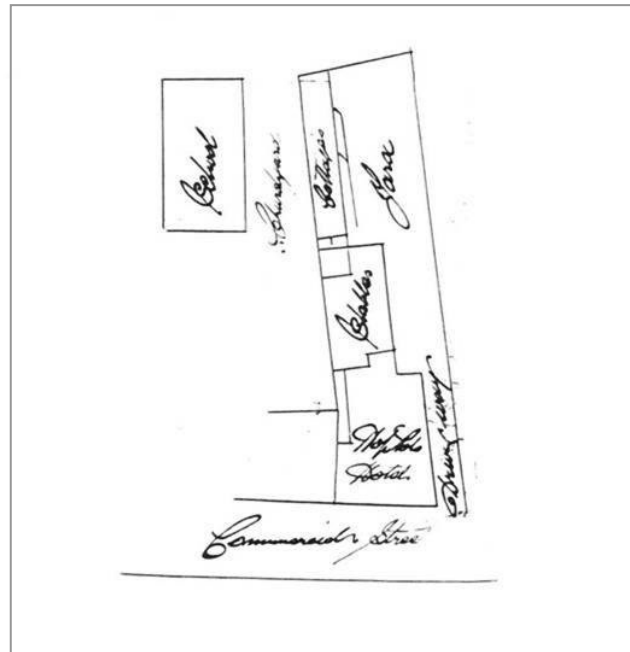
Architects' plans and elevations for the conversion of the Hop Pole Place into stables. The plans were approved at a meeting of the Roads and Buildings Committee on 14th March 1905.
